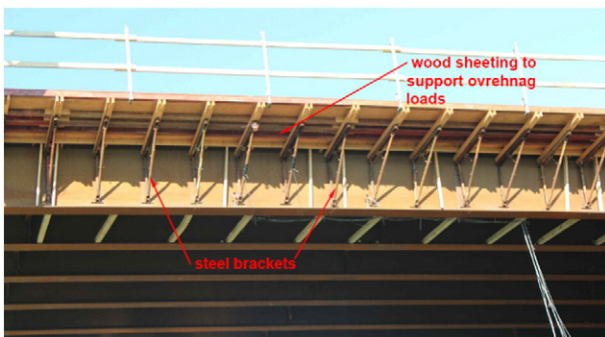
Overhang deck formed by wood sheathing supported with cantilever steel brackets.
